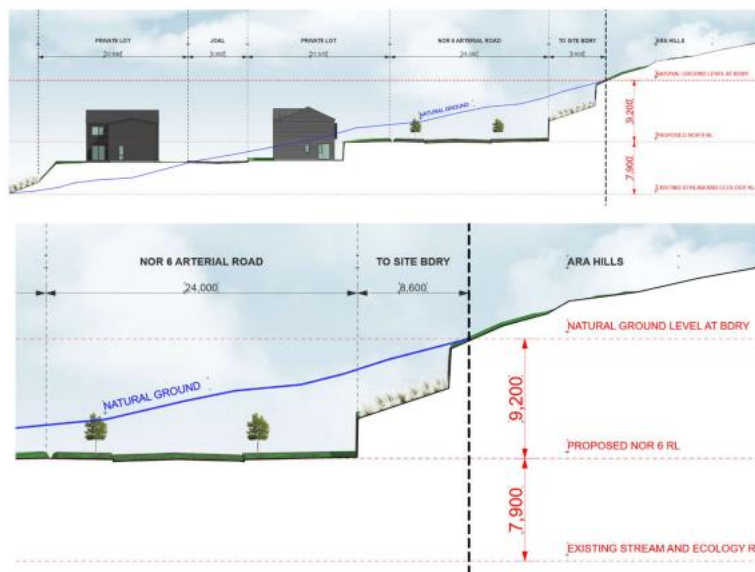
Cross section highlighting the level difference between existing streams, the proposed NOR 6 arterial road, and the natural ground level at the northern site boundary.
